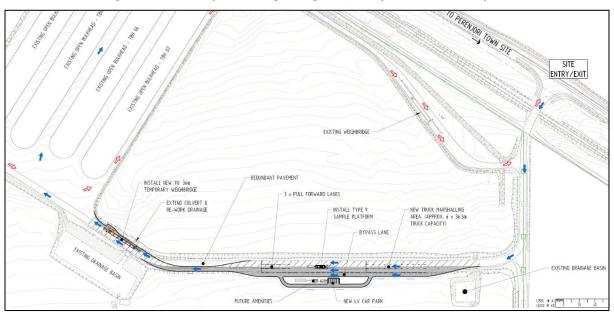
Proposed Weighbridge and Sample Platform site plan
